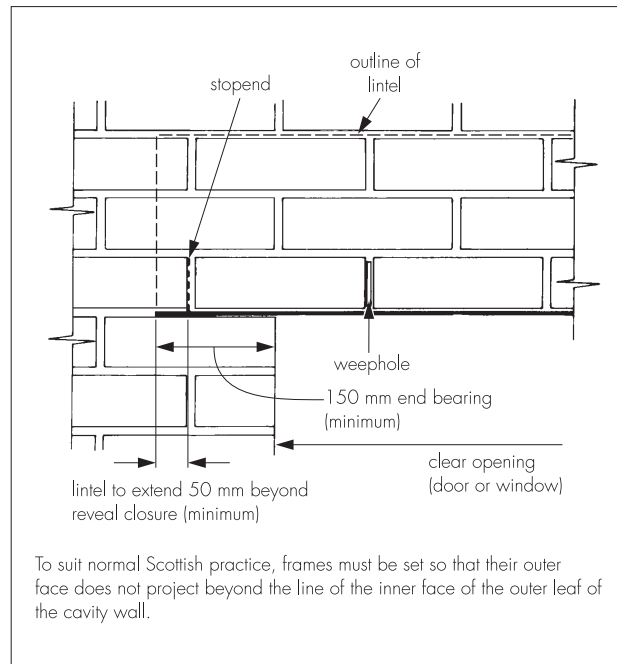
Detail showing minimum end bearing stop ends and weepholes
